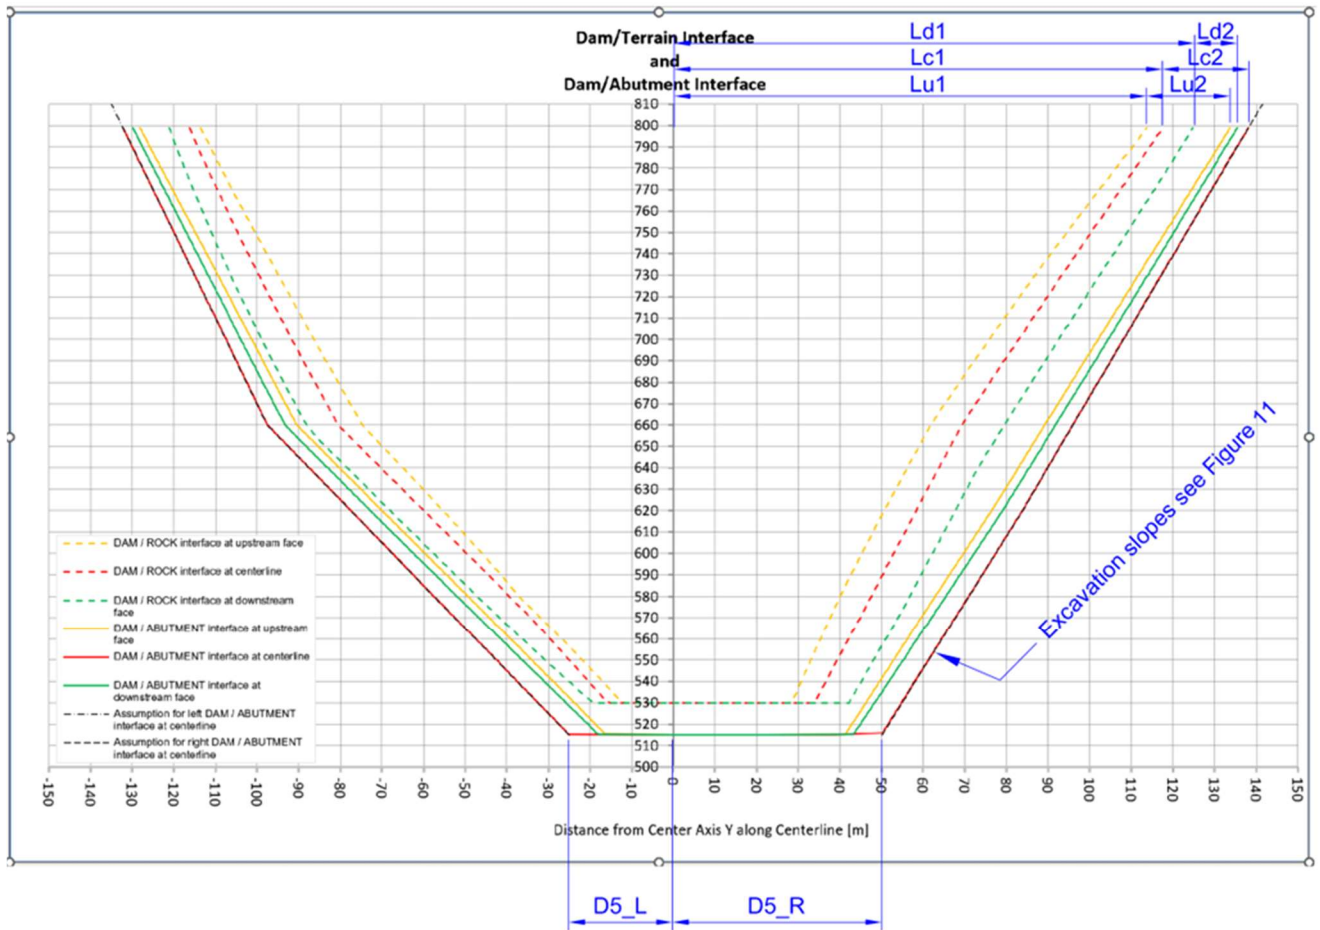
EXCEL output – CHART sheet showing arch dam/abutment interface
